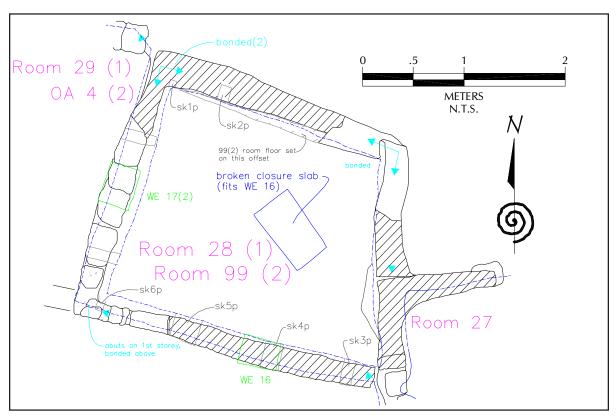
Plan View of Rooms 28(1) and 99(2).
